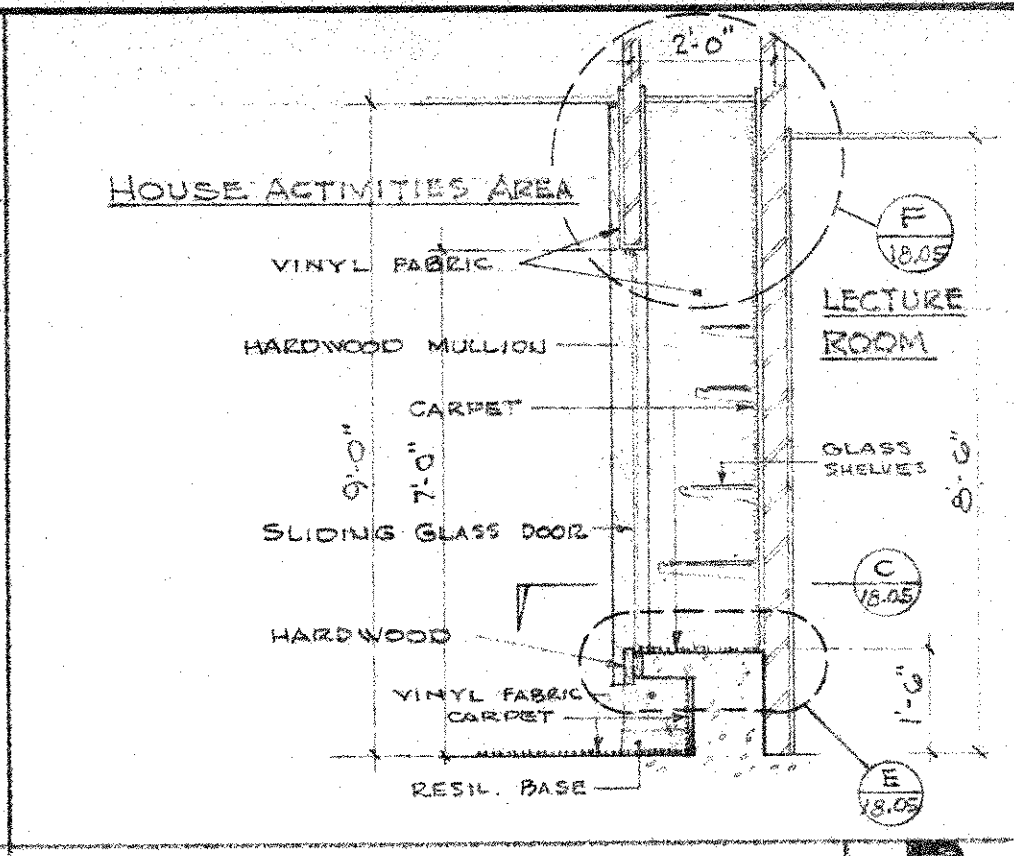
DETAIL D SCALE AS NOTED DET. C SCALE 3"=1'-0" SECTION THRU PLATFORM SCALE 1/2"=1'-0" B
